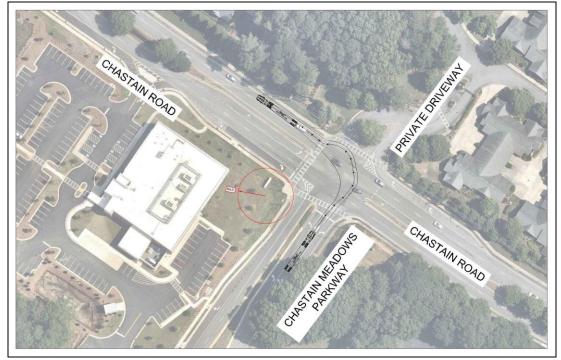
Chastain Road at Chastain Meadows Parkway/Private Driveway – Northbound Left (Exiting Truck)
